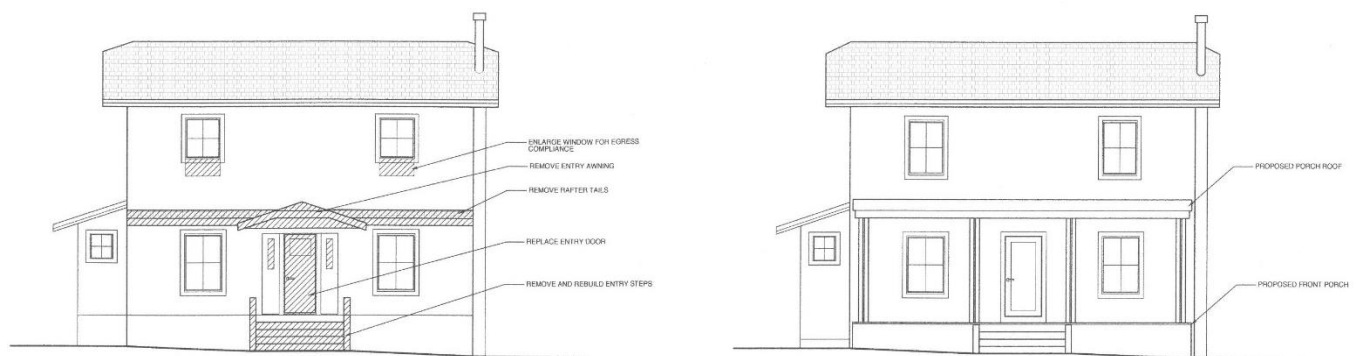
Existing (left) and Proposed North Elevations, 870 University Ave. Shaded area on existing drawing shows scope of demolition.
